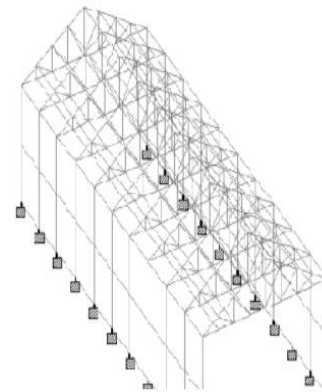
Structure of roof truss from STTAD Pro [Refer from STAAD Pro]
